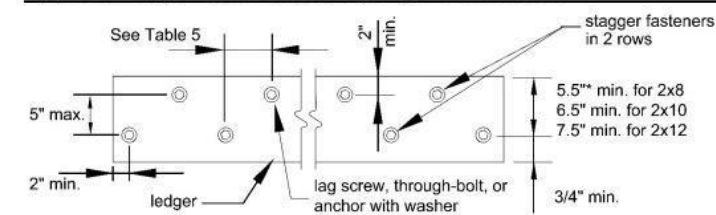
General Attachment of Ledger Board to Band Joist or Rim Joist.
